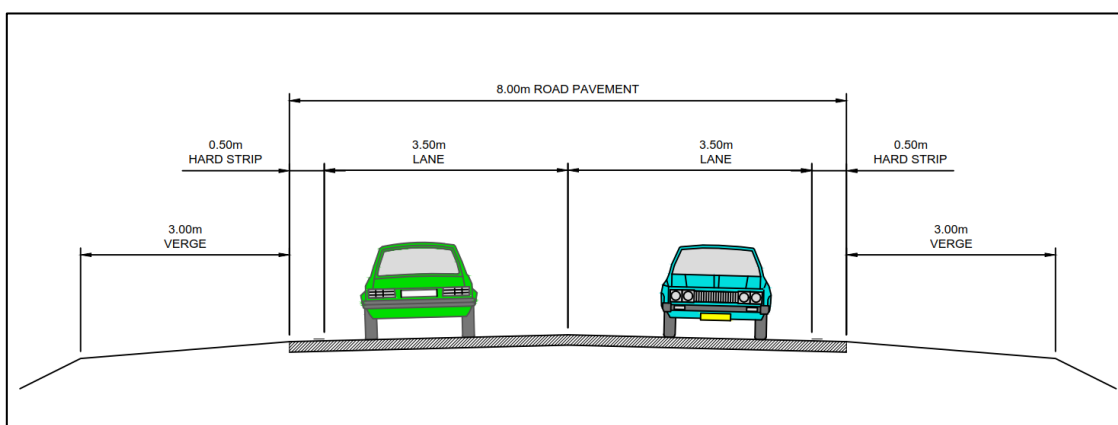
Proposed Cross-Section (Indicative Layout Only)
